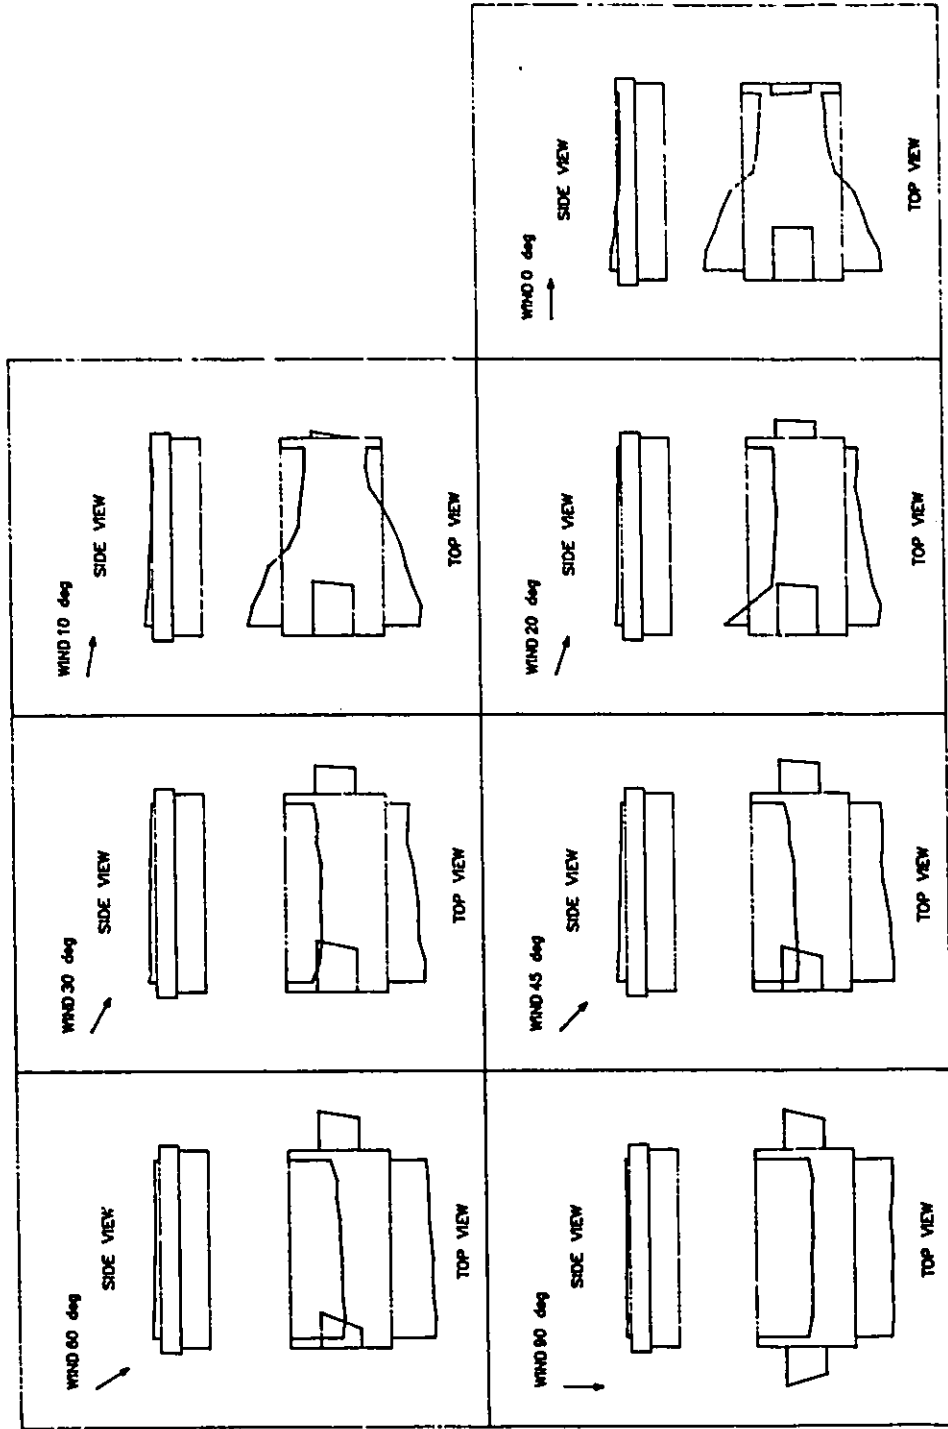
Airflow diagrams: open model, simulated 150 mm ridge and 1100 mm sidewall openings, open end walls, 7 wind angles of incidence. 438
